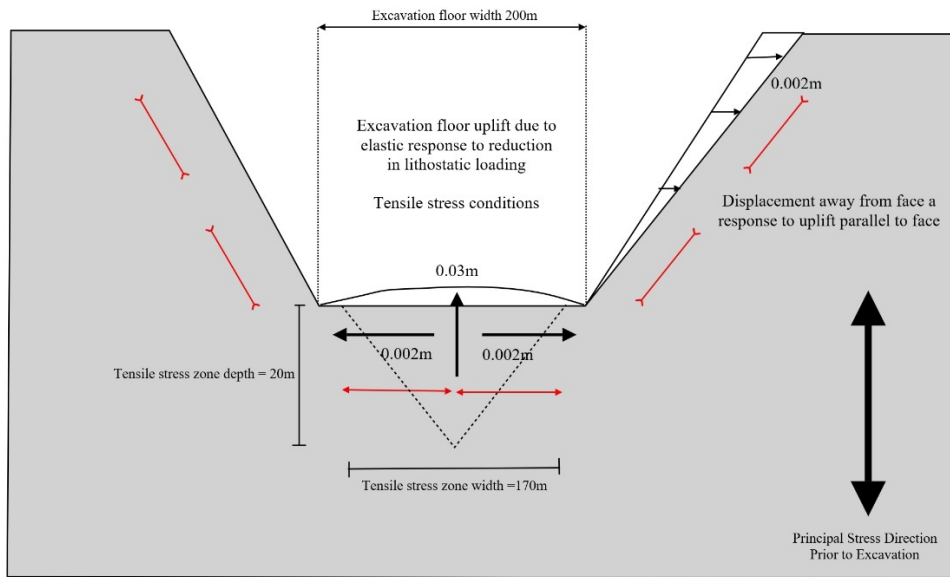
Tension cracking due to quarry floor heave at a 30 m deep quarry excavation in the Lincolnshire Limestone
